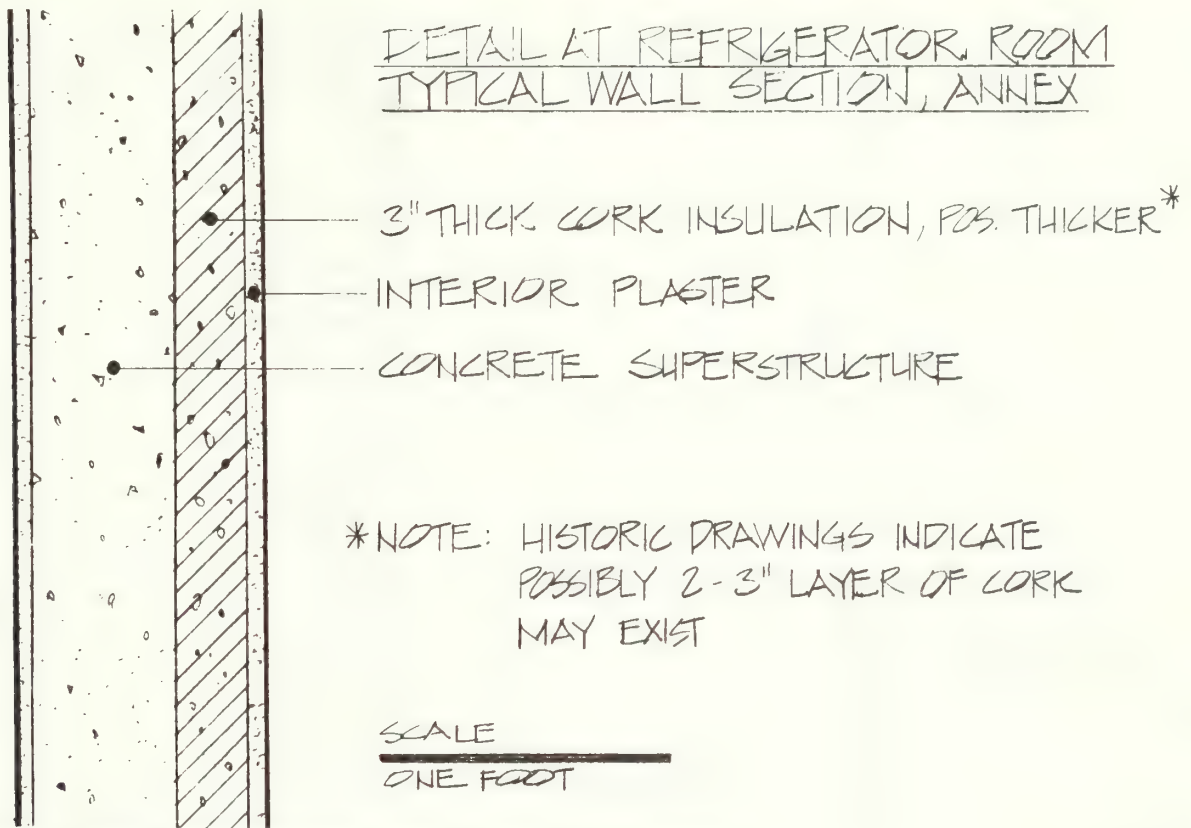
Detail at Refrigerator Room, Typical Wall Section
